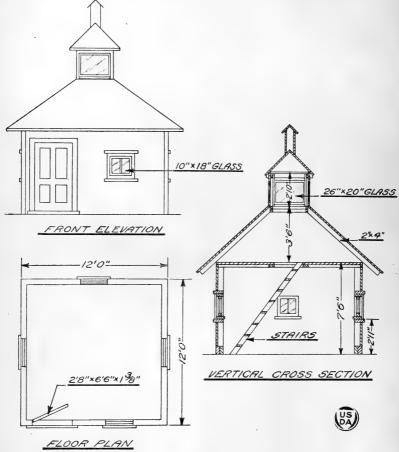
Plan of watch tower commonly used in circular ranches.
